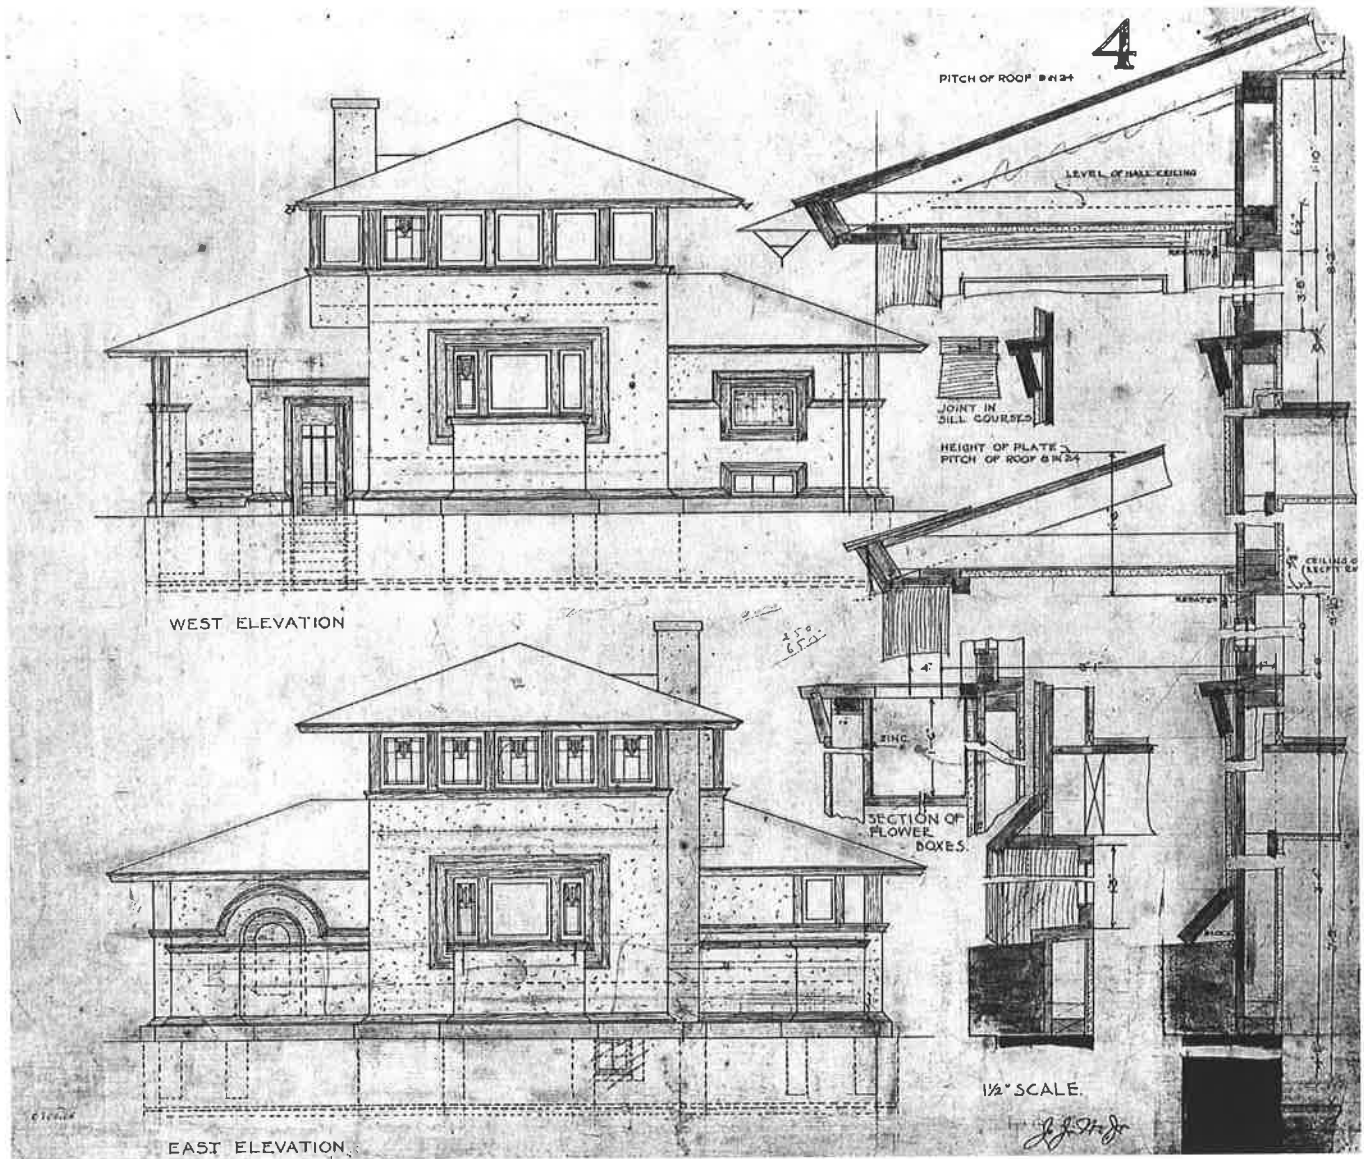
Original Joseph J. Walser House east elevation (bottom left), west elevation (top left), and building sections (right)
